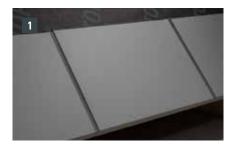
Minimum roof pitch PREFA on-roof gutter
